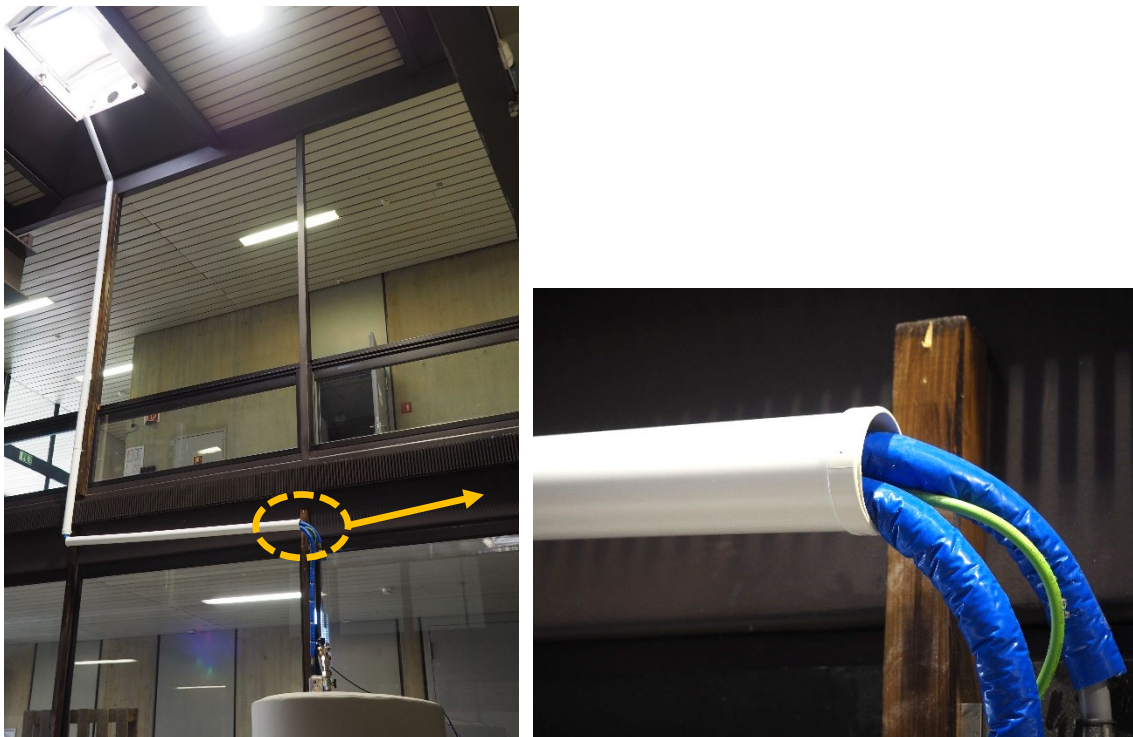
Solar loop, left: section inside the building, right: detail with opening of the waterspout pipe with the two pre-insulated solar pipes (in blue) and an electric cable of the monitoring sensors.
